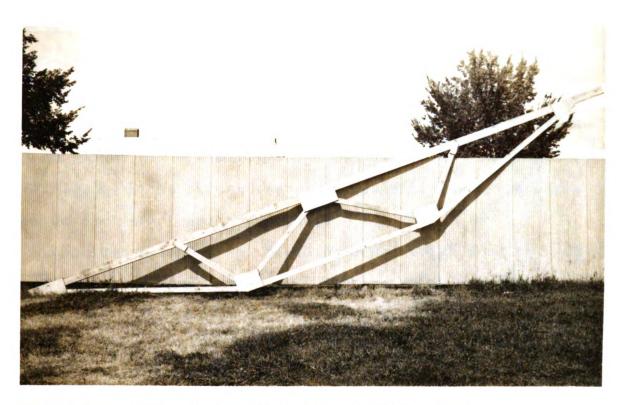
TRUSS "B" - GLUE-NAIL CONSTRUCTION
